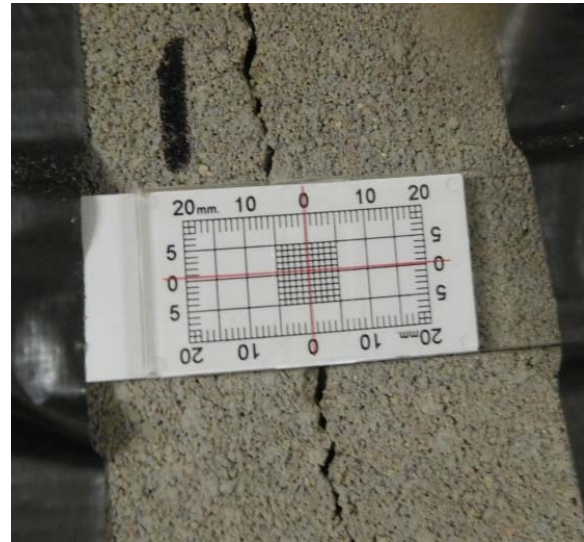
B. Crack Gauge 1 - Area F along east wall of Electrical Room F116.
